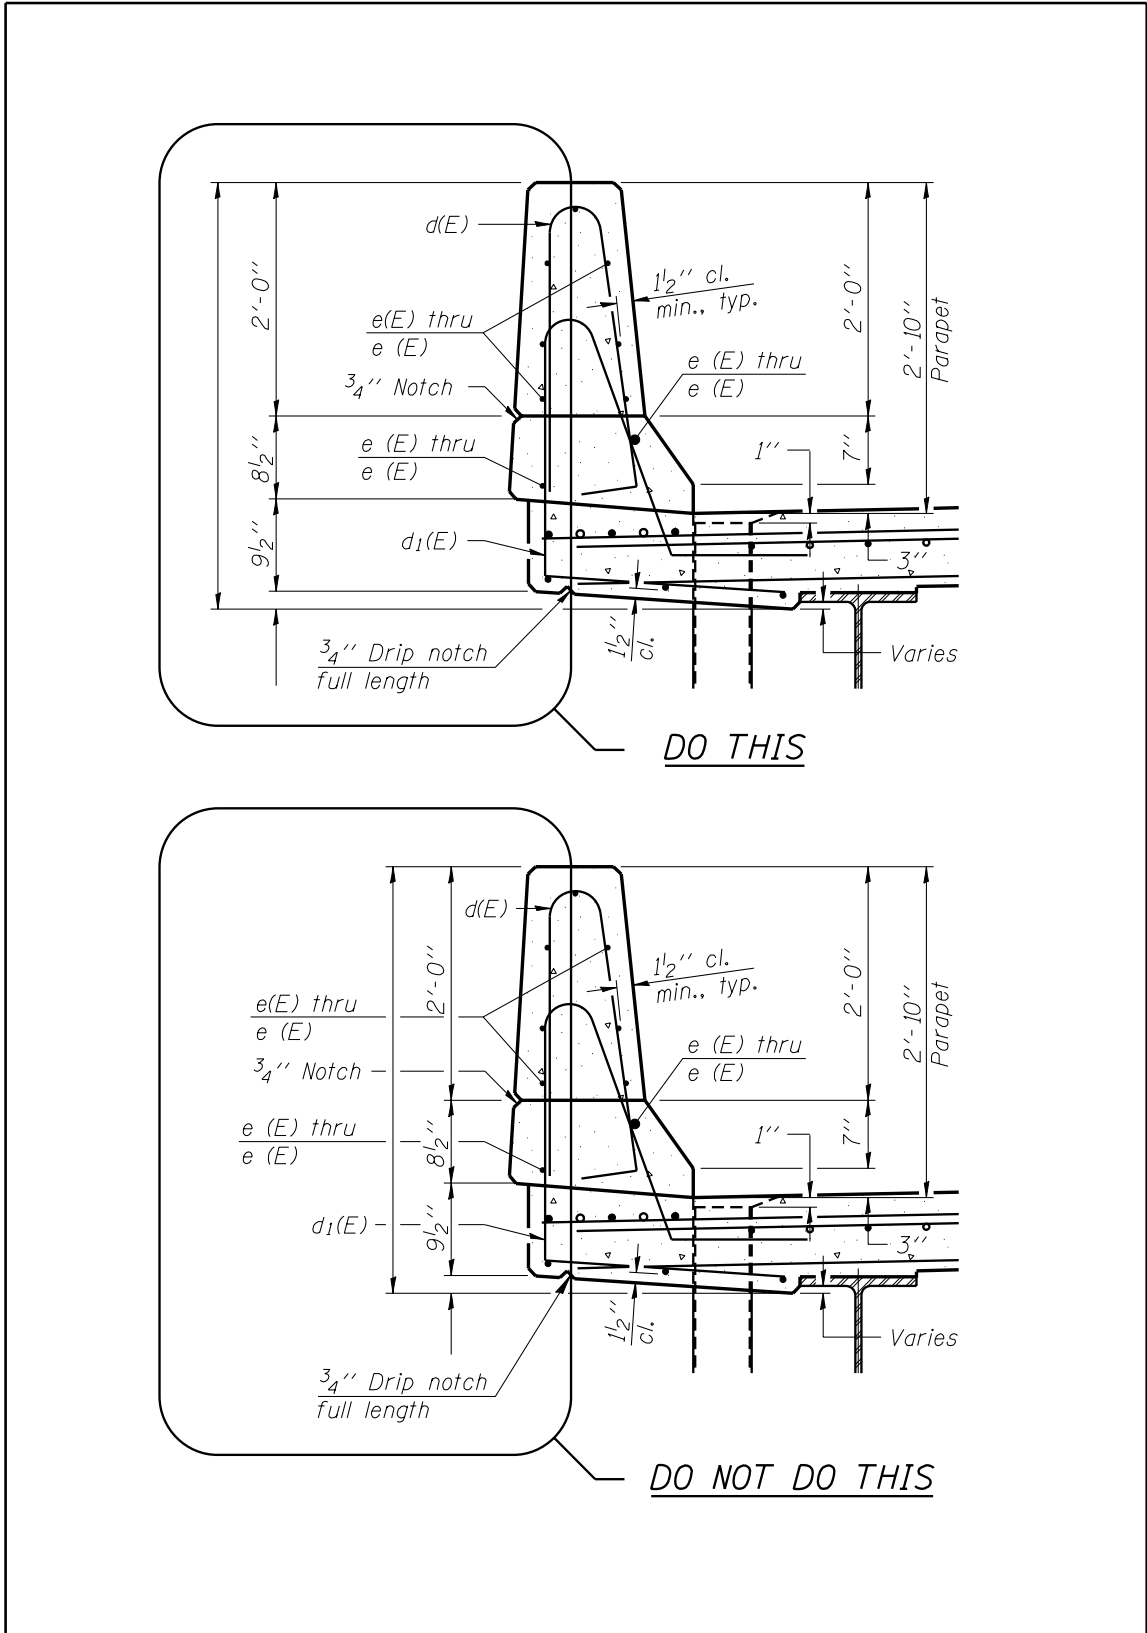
Dimension Placement and Callouts (Example #3)
